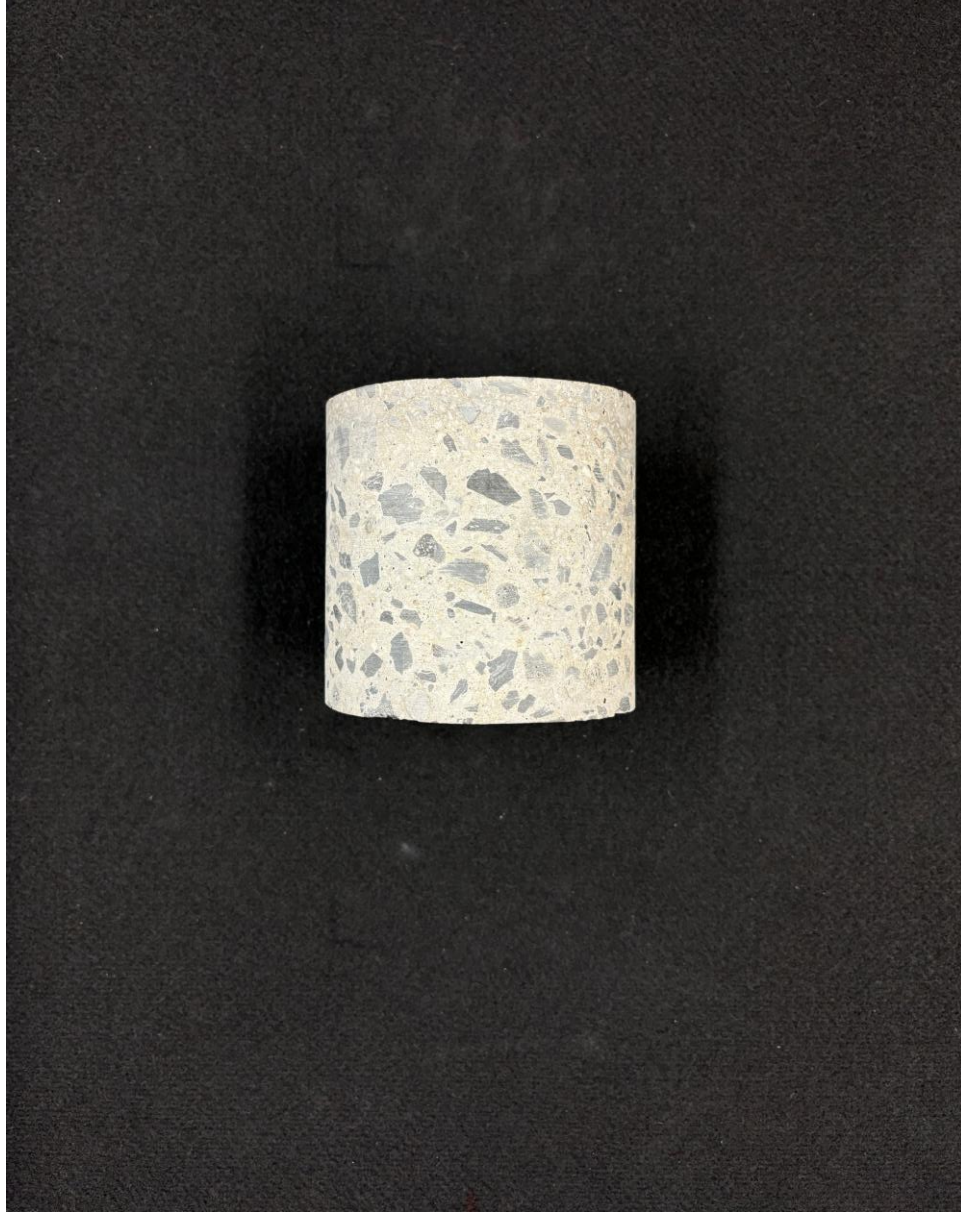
Core 2 of lightweight concrete deck at bridge C-989.
